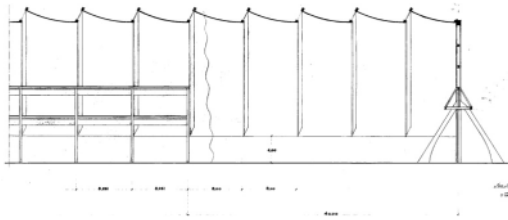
Elevation and longitudinal section of part of the proposed project for the 1938 CASA warehouse (Archivo Eduardo Torroja).
